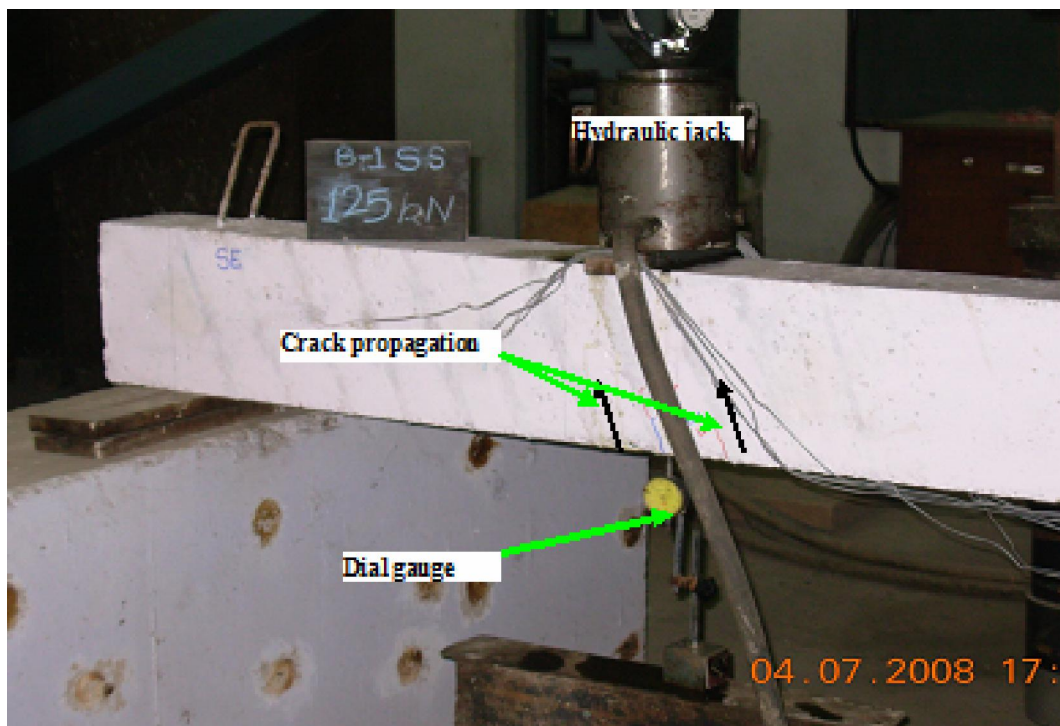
Test B1-SS crack pattern at 125 kN (Face SE)
